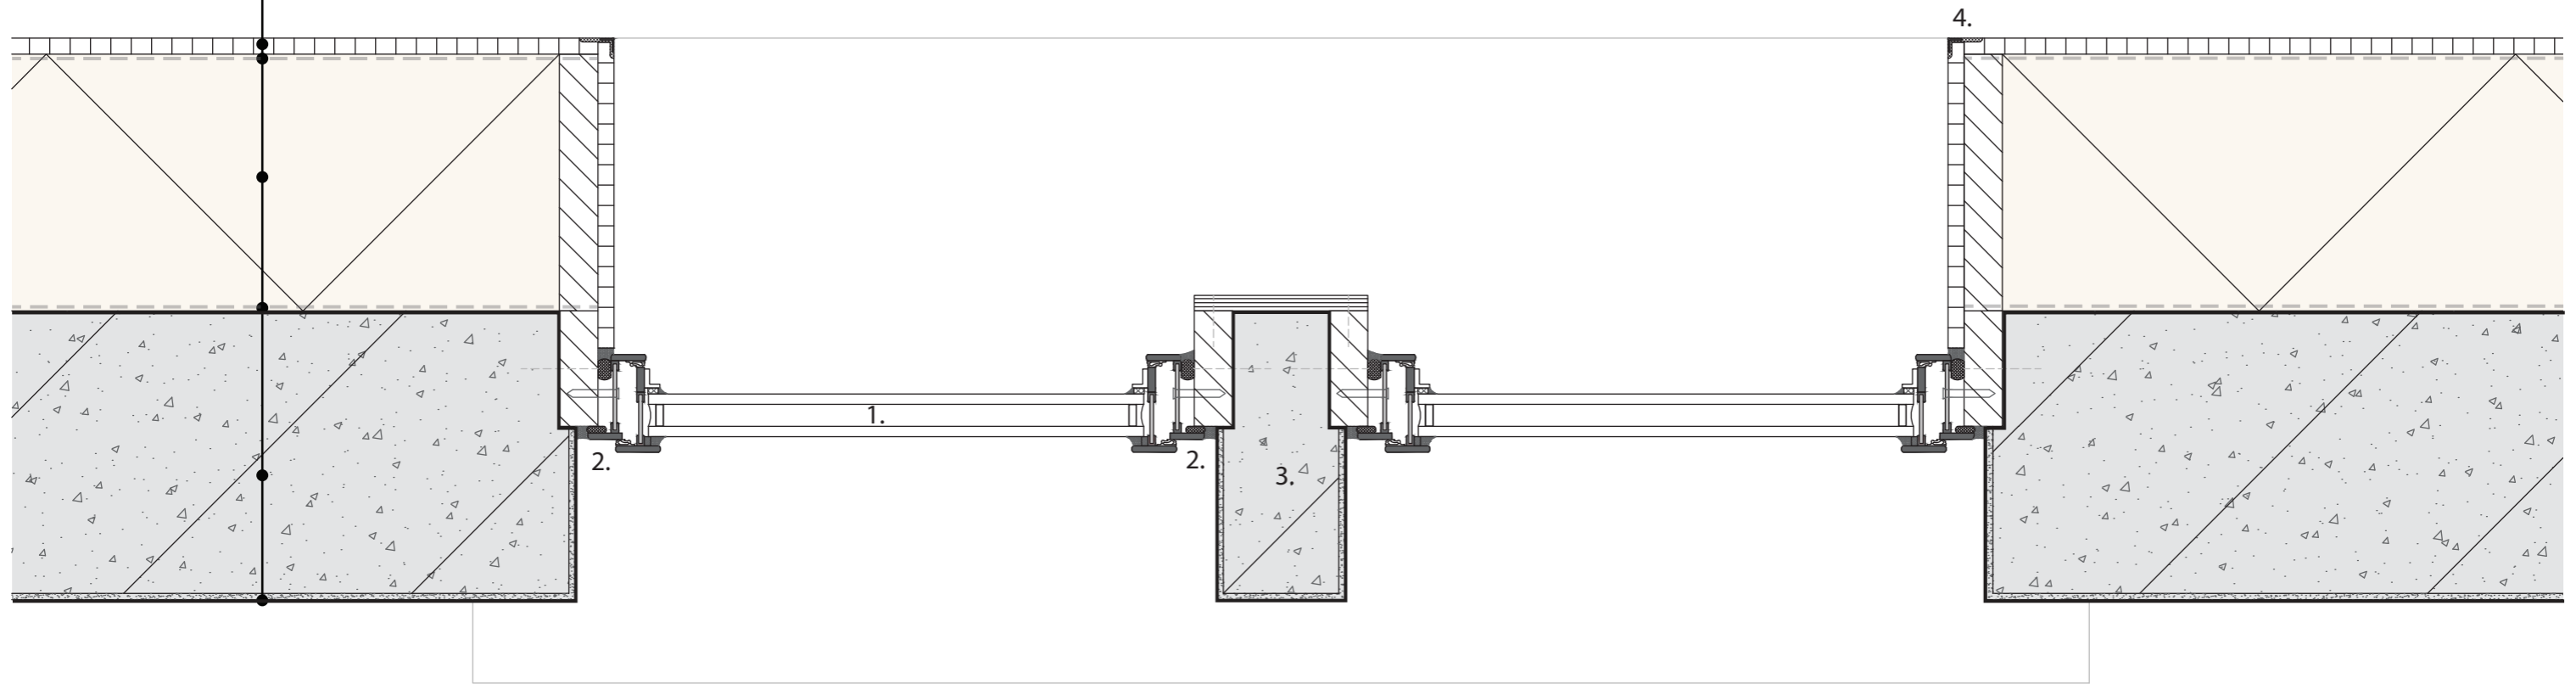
HORIZONTAL WINDOW DETAIL
